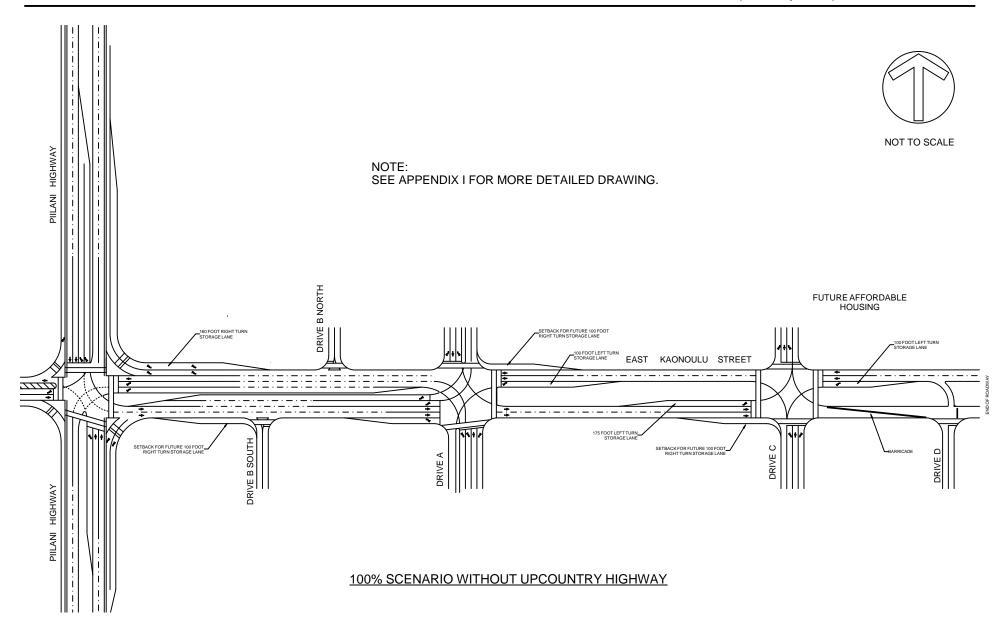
SCHEMATIC DRAWING OF EAST KAONOULU STREET
